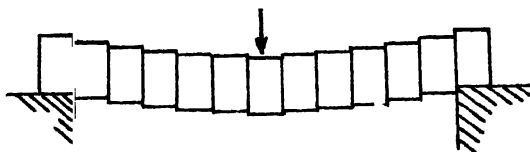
VERTICAL AND HORIZONTAL SHEAR FORCE ACTION
